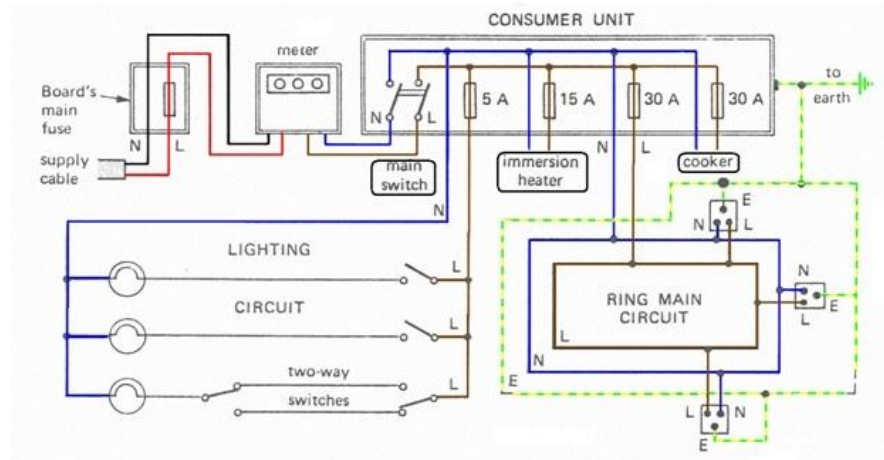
Domestic electrical wiring [Electrical-Equipment].
